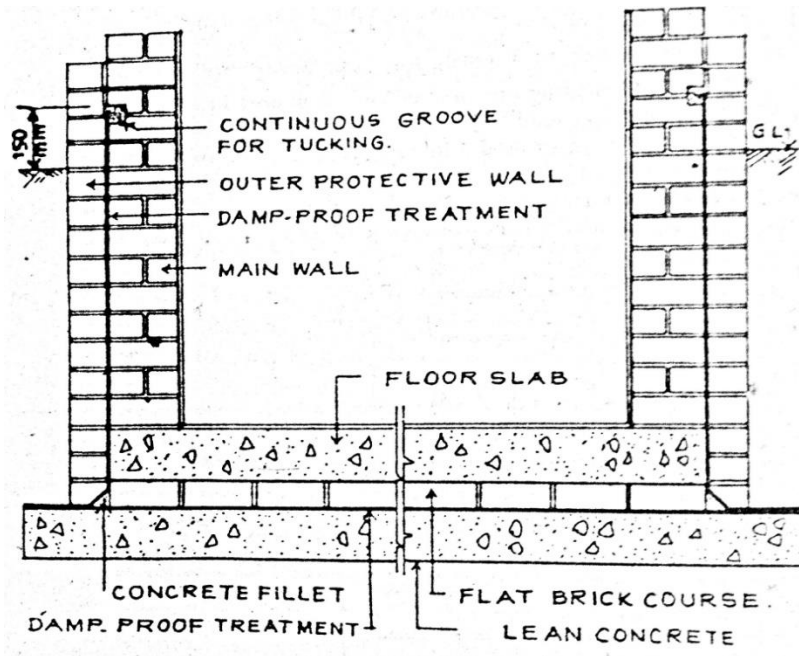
Water Proofing For Simple Basement in Ordinary Soil
